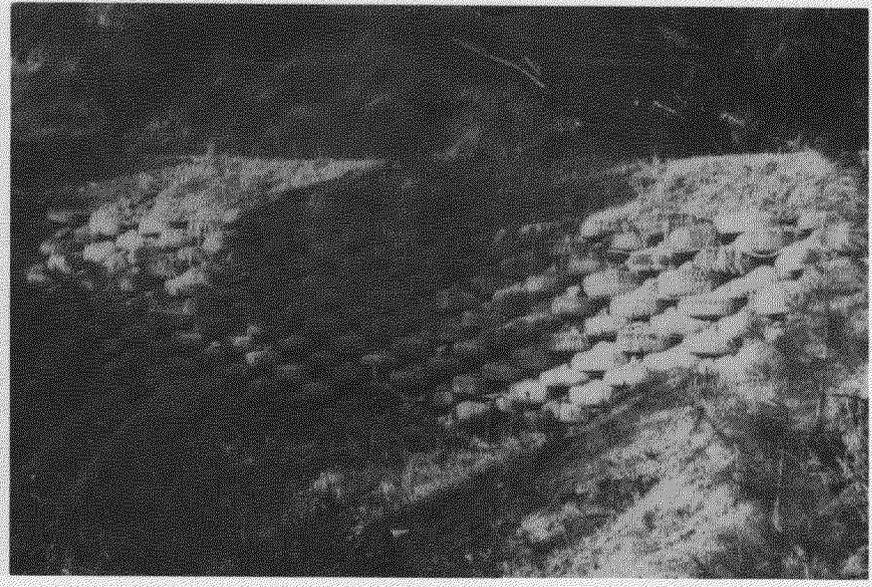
Road repaired using geotextile-faced reinforced soil wall/slope.
